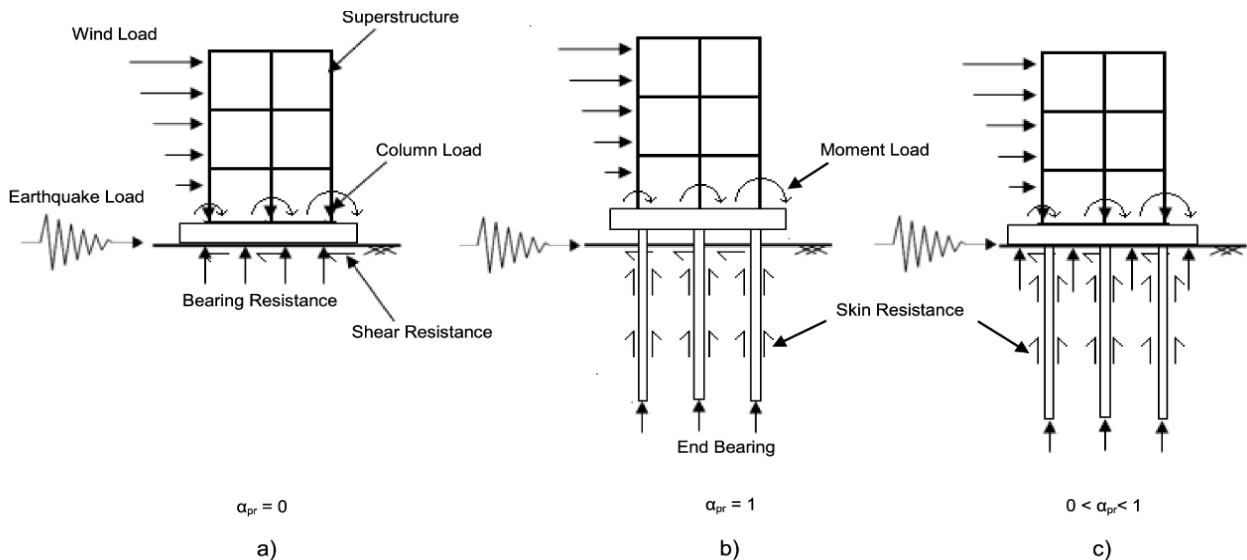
Interactions between pile, raft and soil in a piled raft foundation (Kacprzak, G. M. et al., 2024)
